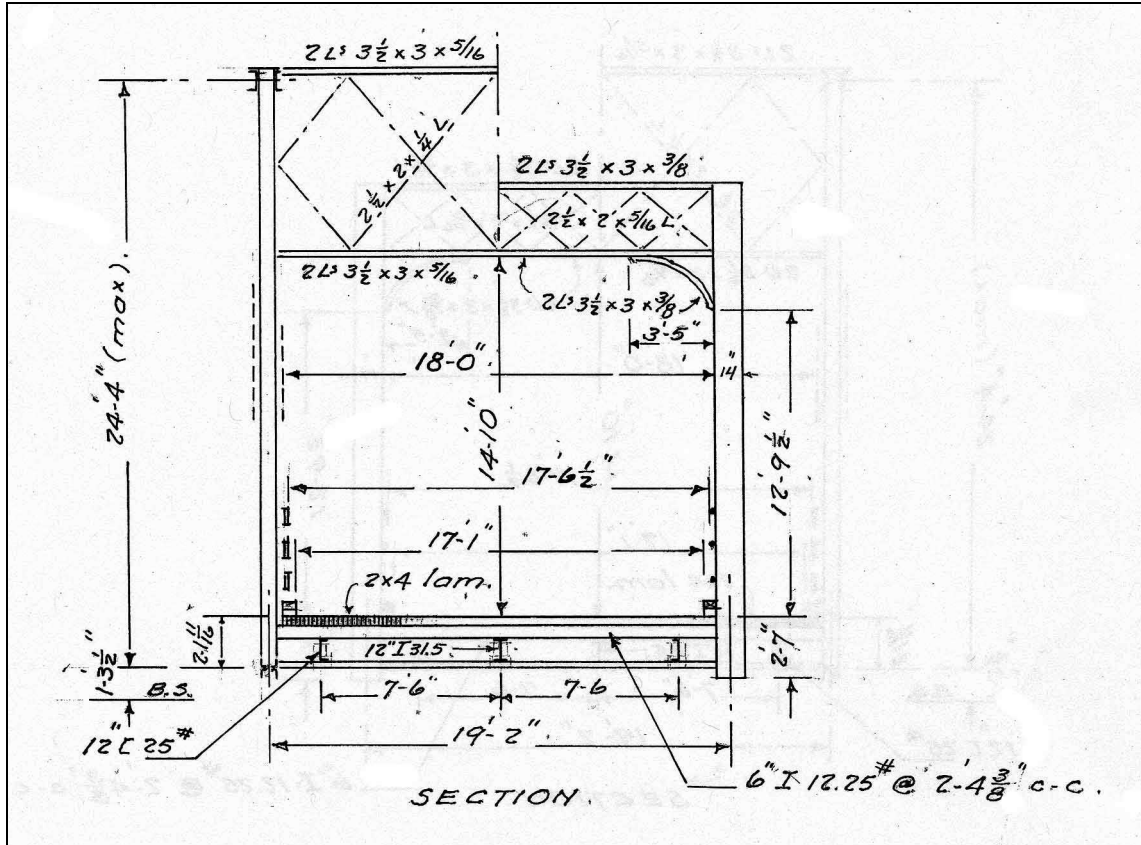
Bridge Cross-Section sketch from NHHD Bridge Inventory Card (1940).
